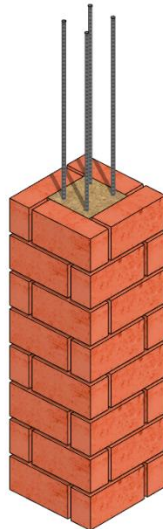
2 Brick Thick Rat Trap Bonded Wall with Corner Reinforcement
